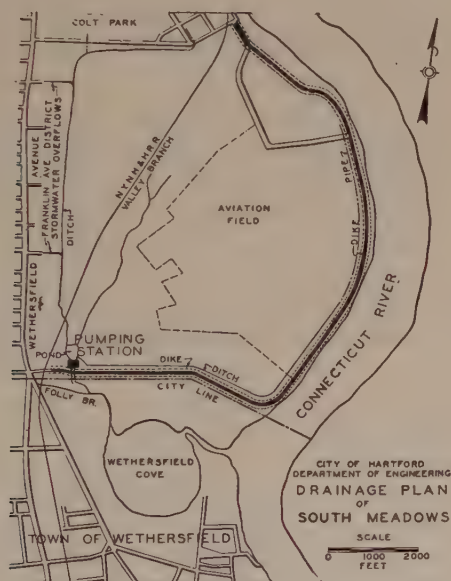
DRAINAGE PLAN OF SOUTH MEADOWS
